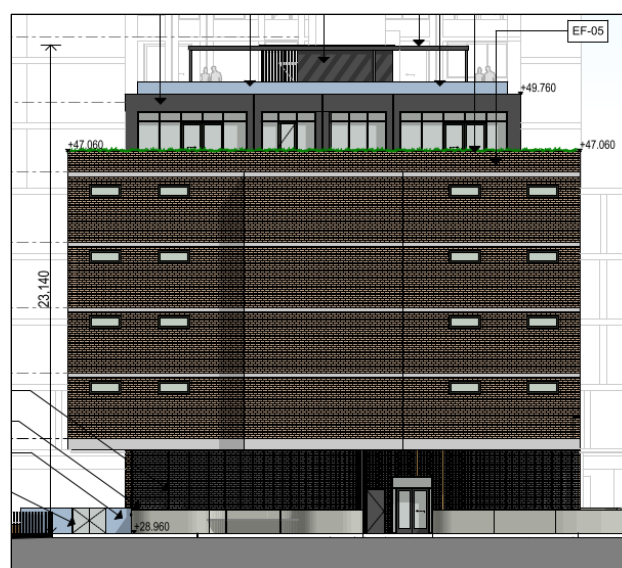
Northern elevation of Building A, where high sill windows are proposed that cause a non-compliance for building separation.
